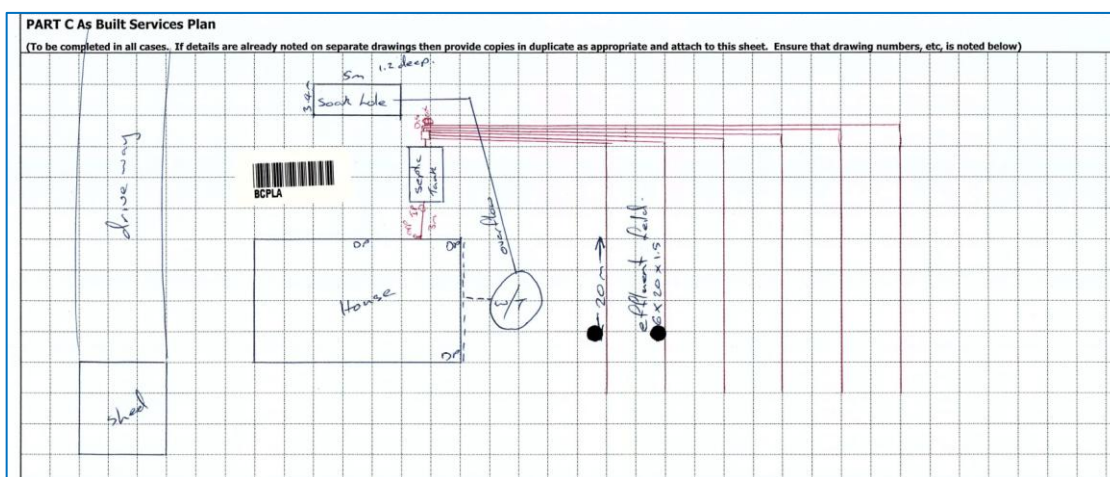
As built plan showing existing stormwater and wastewater services on Lot 1.
